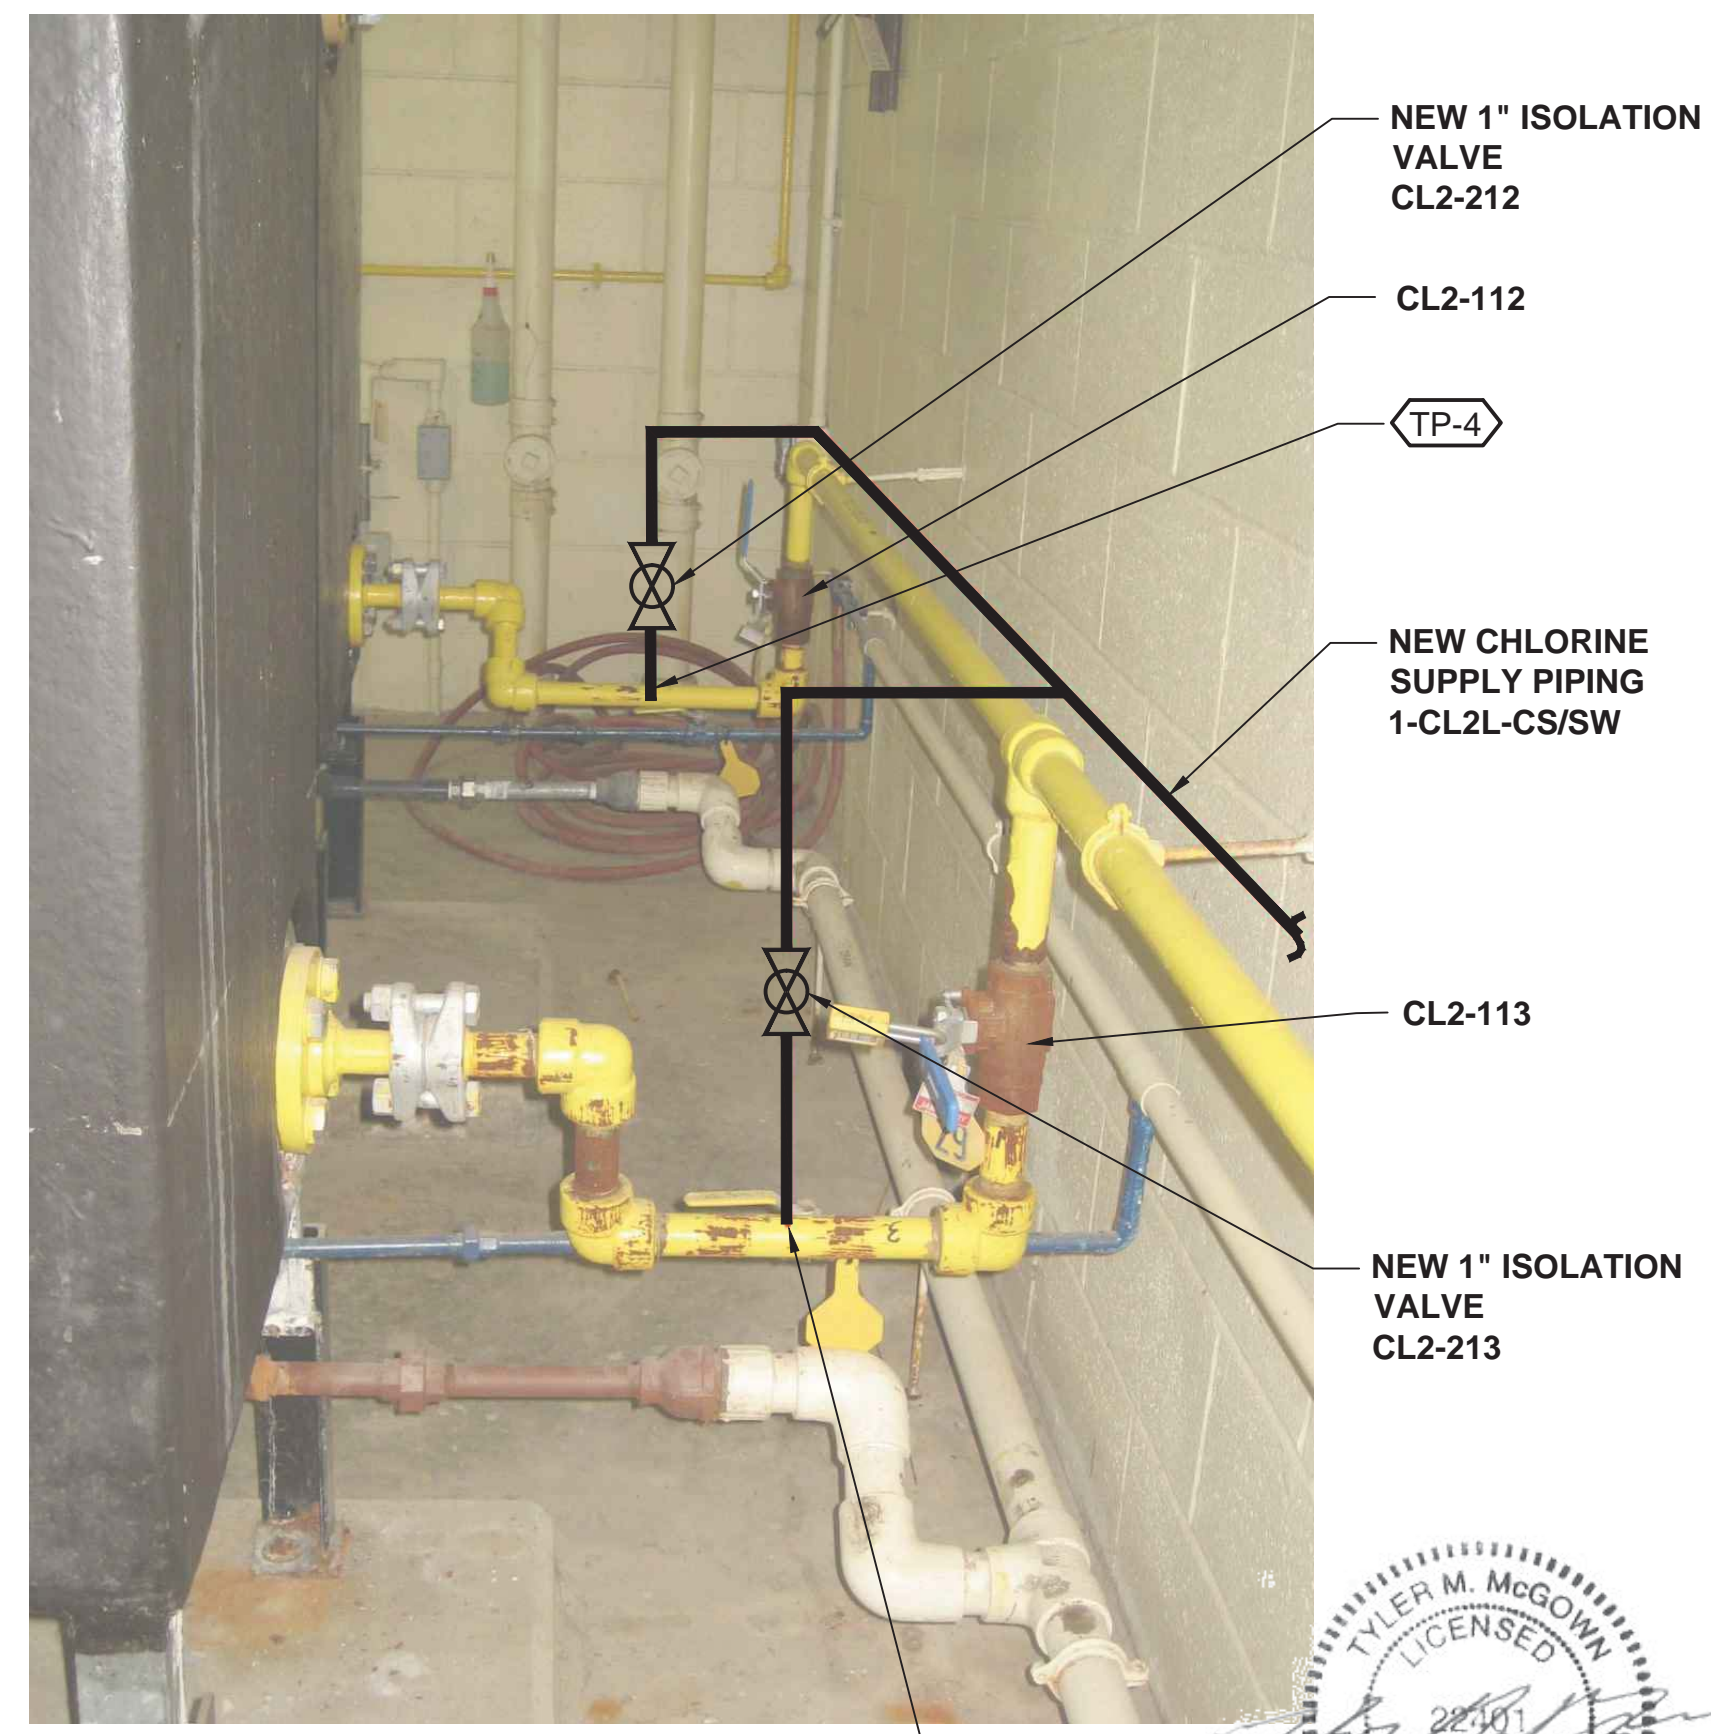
NEW CHLORINE PIPING AT EVAPORATORS
